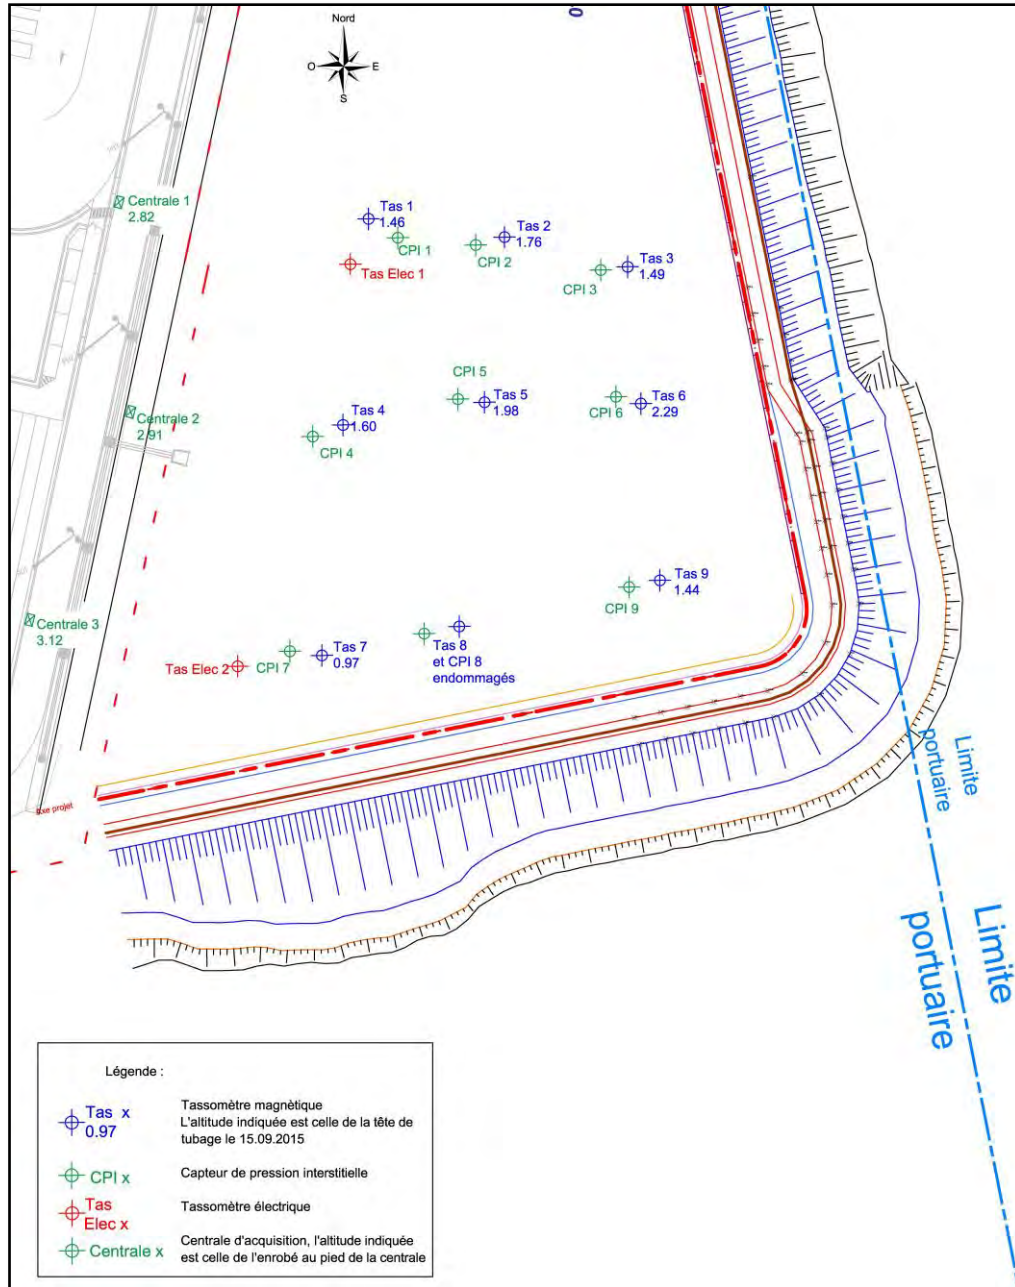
Project instrumentation layout (Ginger-Geolab drawing (2015))
